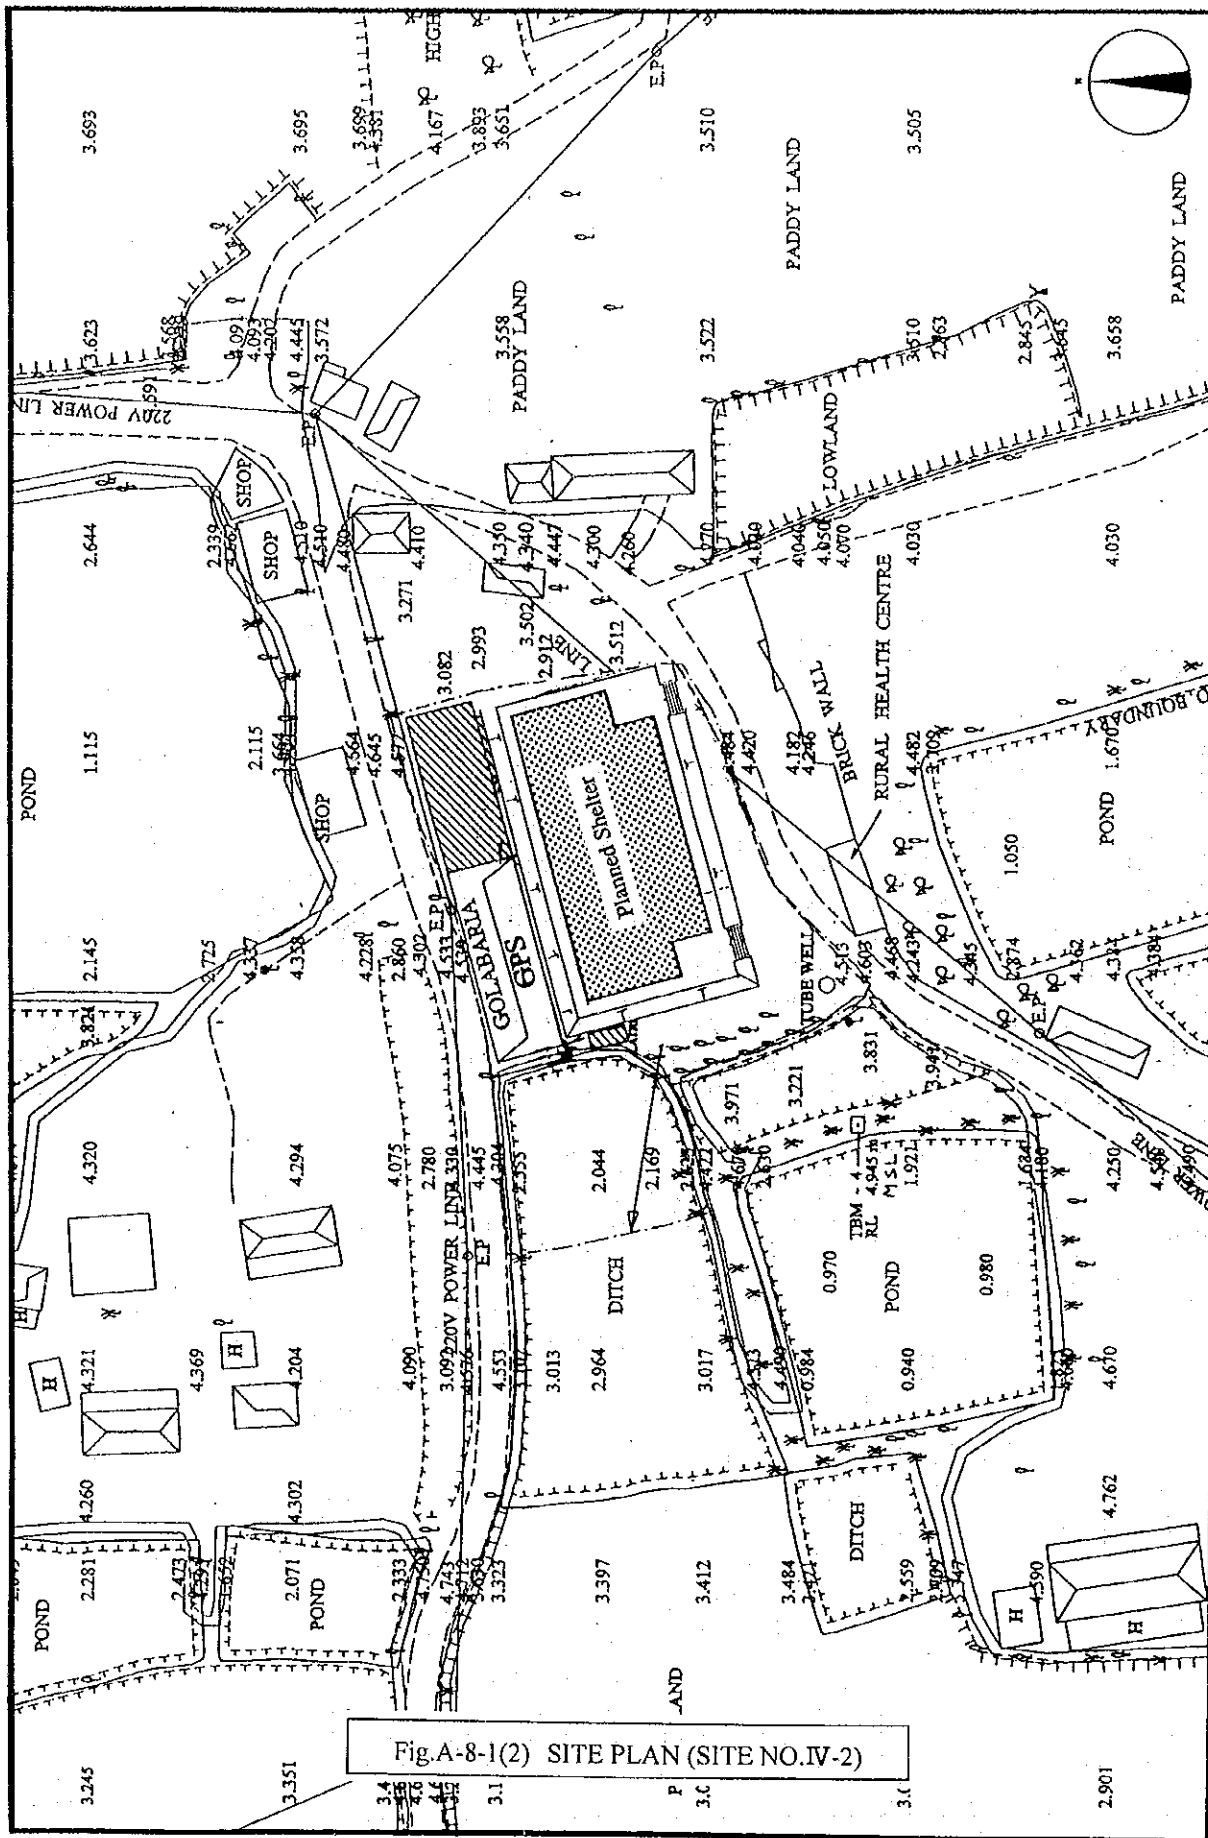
(2) SITE PLAN (SITE NO.IV-2)
